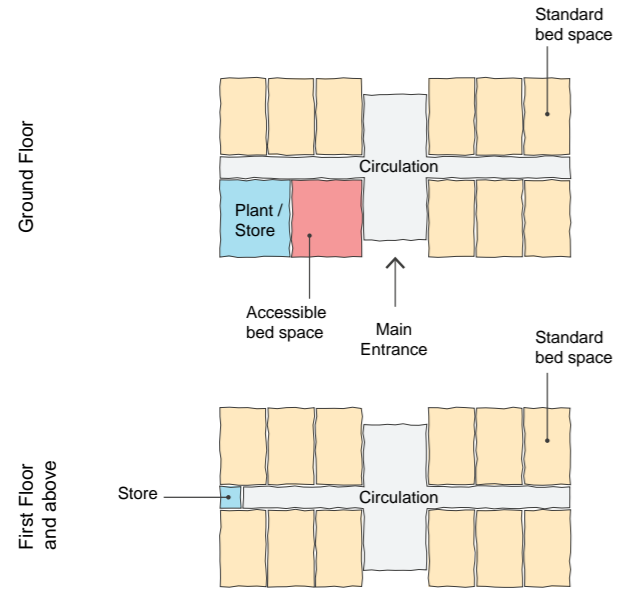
Small Accommodation Block Layout (3 and 4 Storey)
